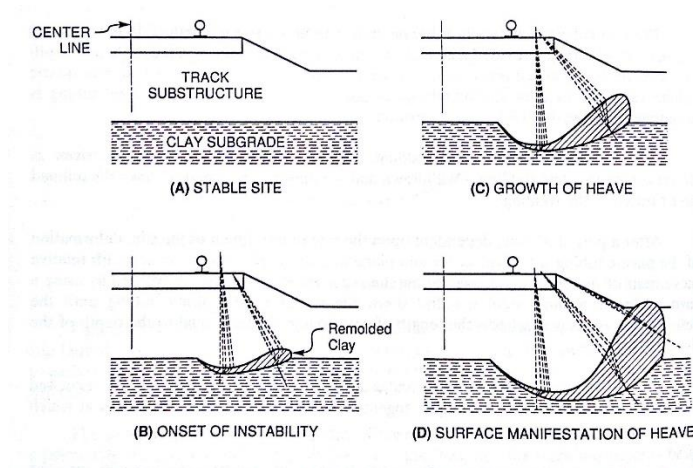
Track subgrade failure caused by repeated loading (after Selig & Waters, 1994)
